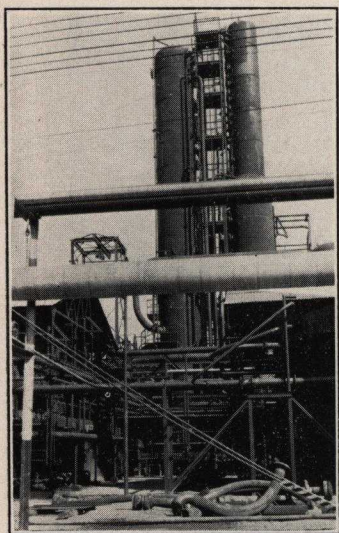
Cracking Tower in a large Oil Refinery. Steel plates protected against corrosive action at temperatures of 700 to 800 degrees Fahrenheit with 2 inches of Lumnite-HAYDITE-Gunite; Reinforcing consists of cyclone fence mesh welded to inner face of steel plates on 6 inch centers; "AX-3.25" Refractory HAYDITE Aggregate is ideal grading for cement gun work of this character.
